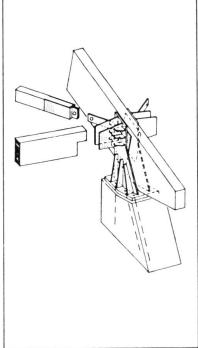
Suspension of a rib to the tower and connection of a rib to the foundation.
